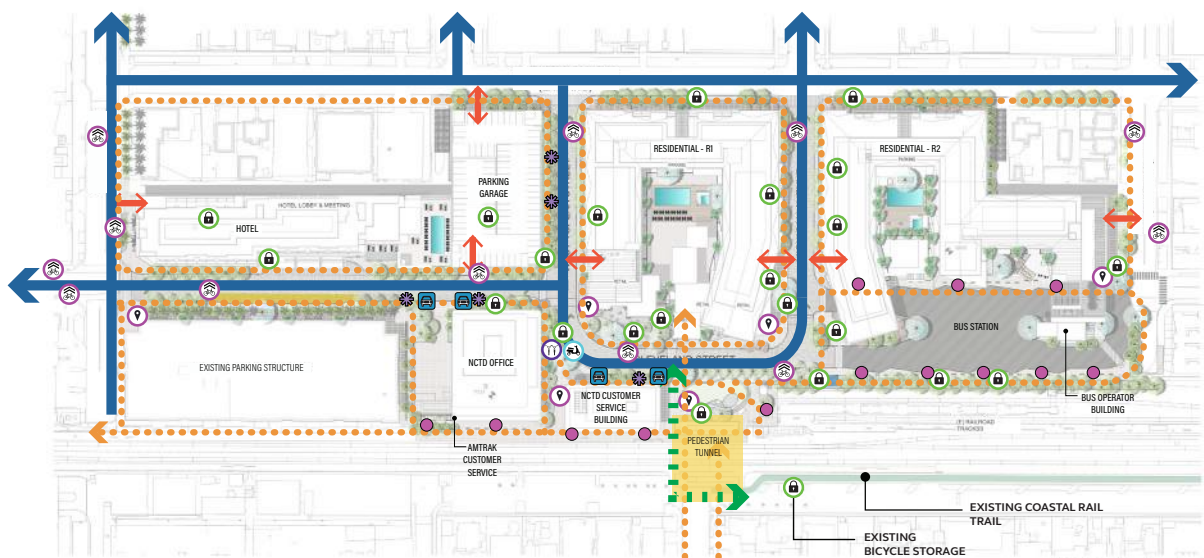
Pedestrian Circulation Framework Plan
